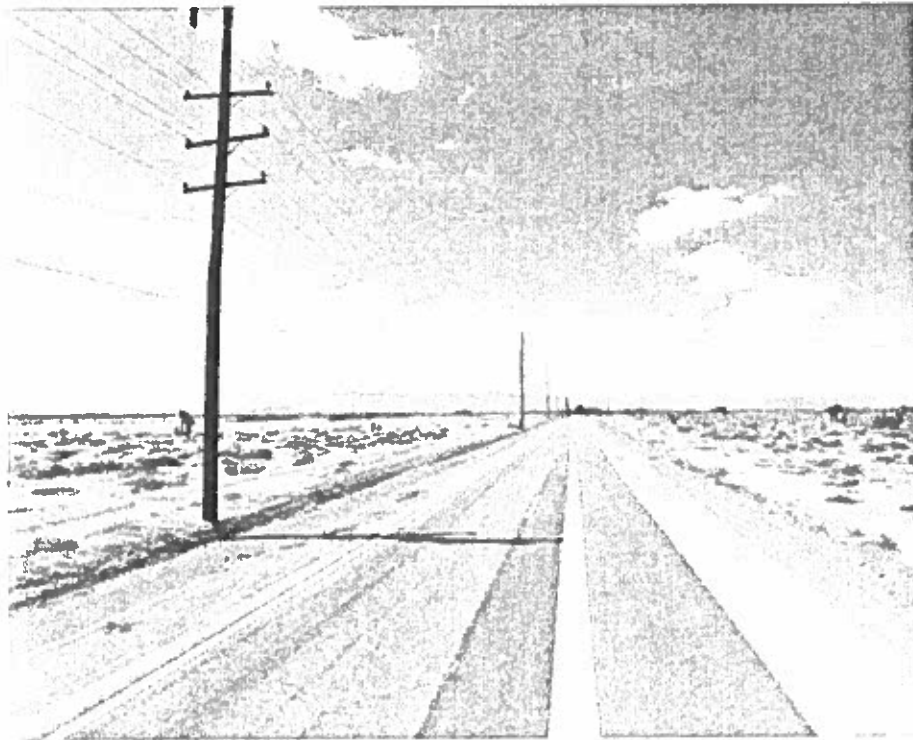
90th Street East, South of Avenue F-8 (looking Southerly)
